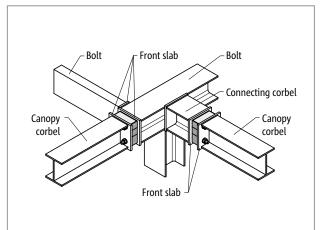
Schöck Isokorb® T type S for outer corner detail
